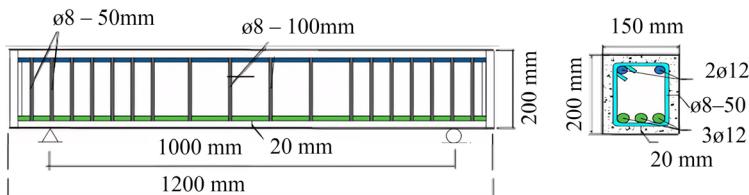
Reinforced beam with a concrete cover of 20 mm
